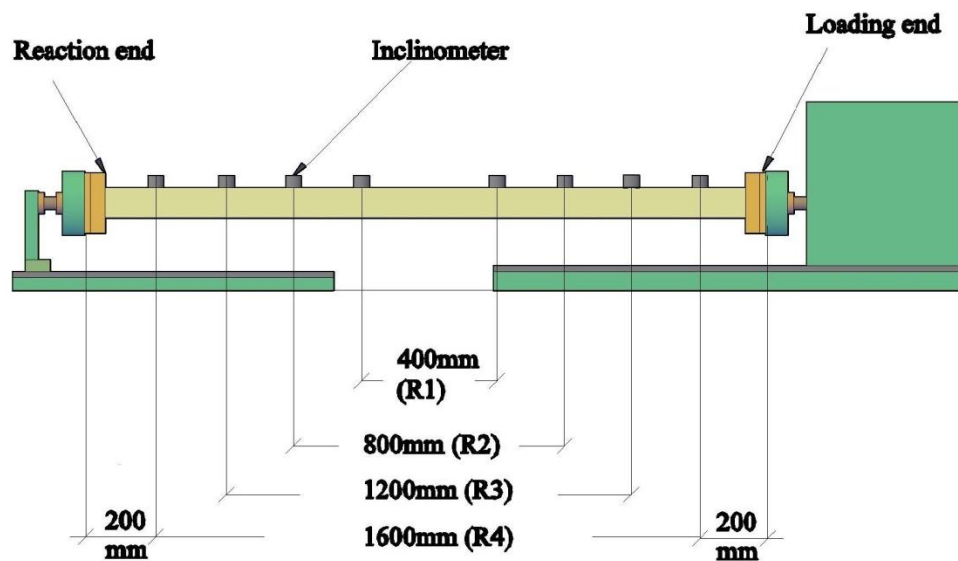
Testsetup (2) for 2m joists for attaining the G of overlapping sections.
